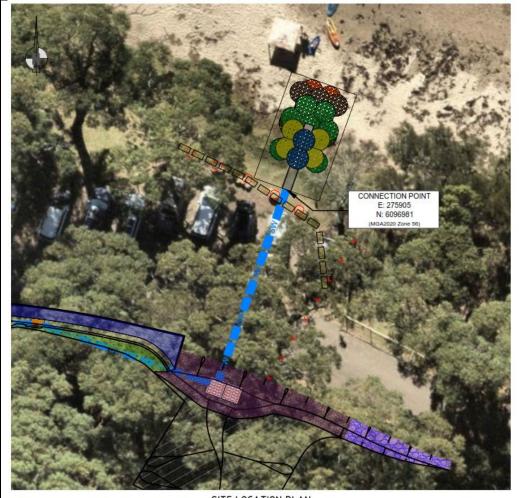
The proposed activity – beach outlet (refer to detailed plans in Appendix A)
